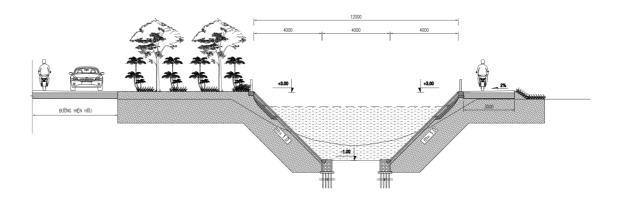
Typical Cross Section of T1 Canal Embankment
